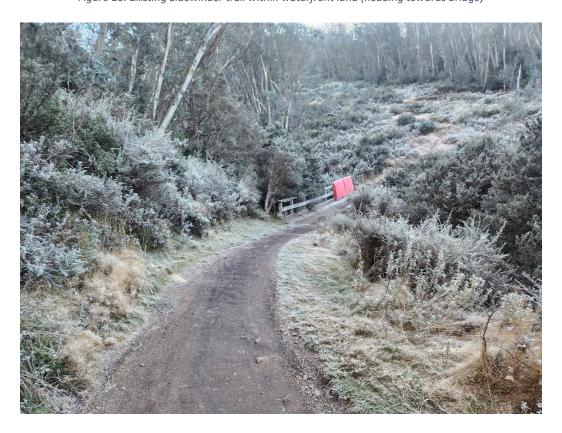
Existing Sidewinder trail within waterfront land (heading towards bridge)
